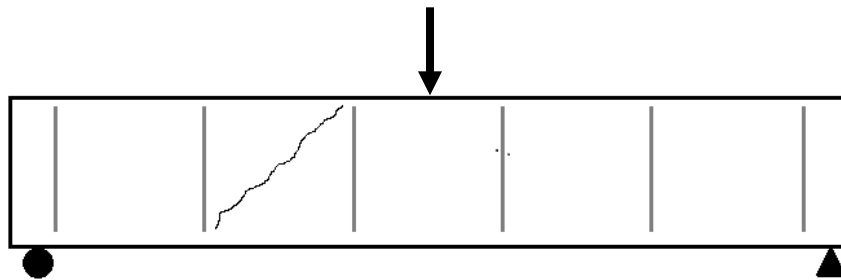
Inclined crack between widely-spaced transverse reinforcement
